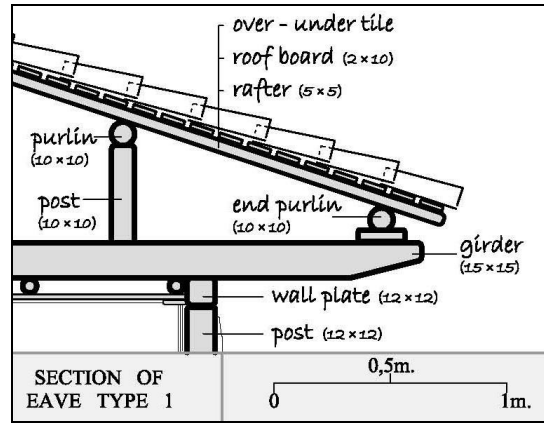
, Section of a 100-130 cm wide uncovered timber eave
